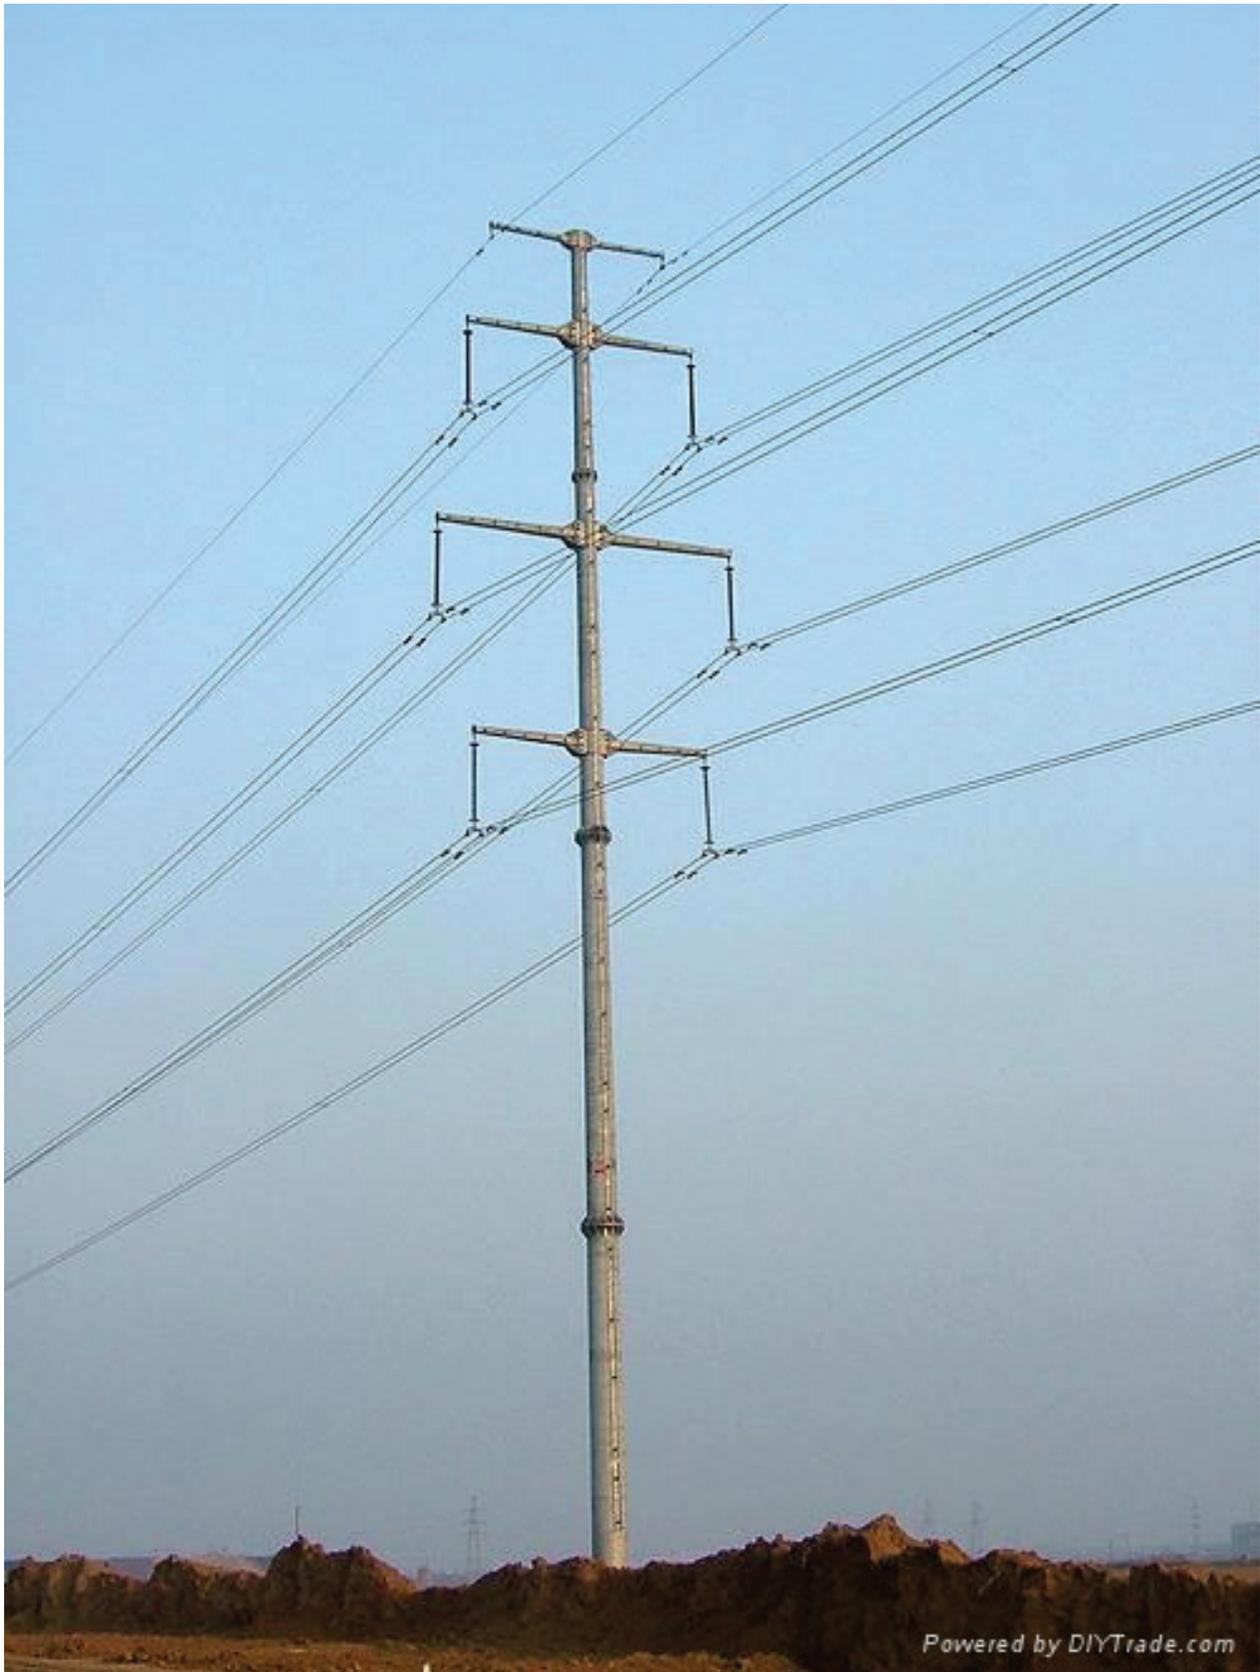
TYPICAL STEEL MONOPOLE TOWER
